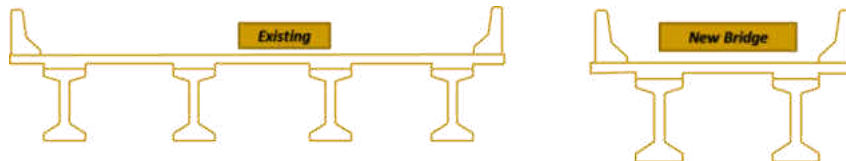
Option IV – One – Side Widening (New Bridge Expansion)
